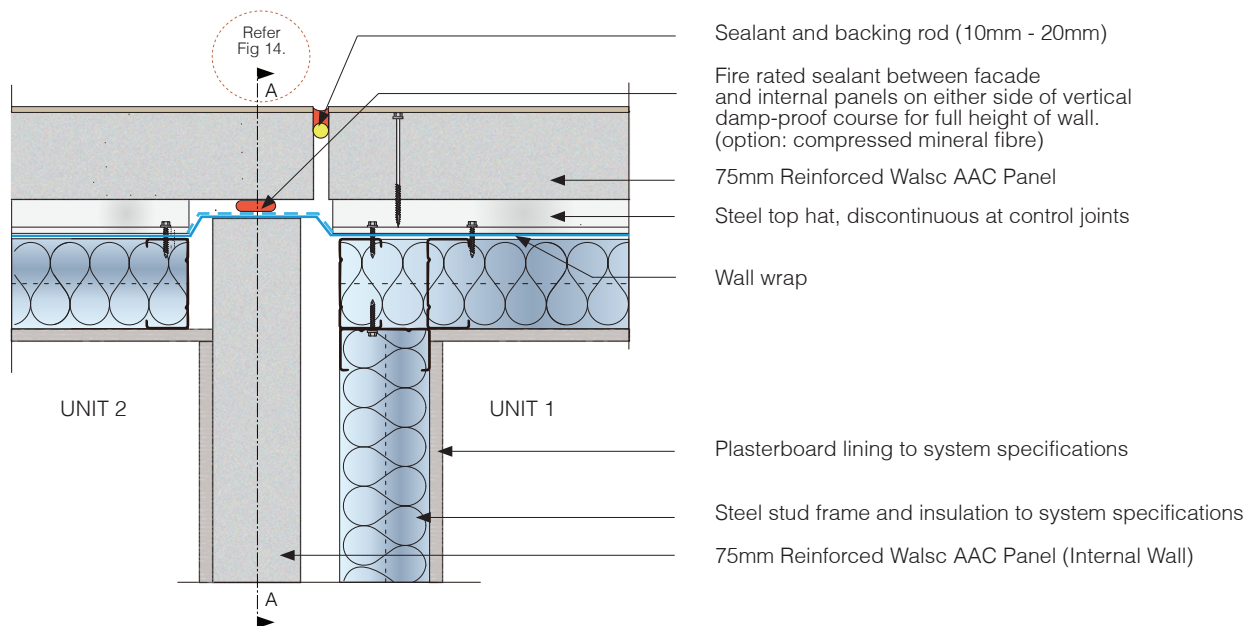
Inter-Tenancy Wall / Corridor Wall to External Wall Junction Detail 1
